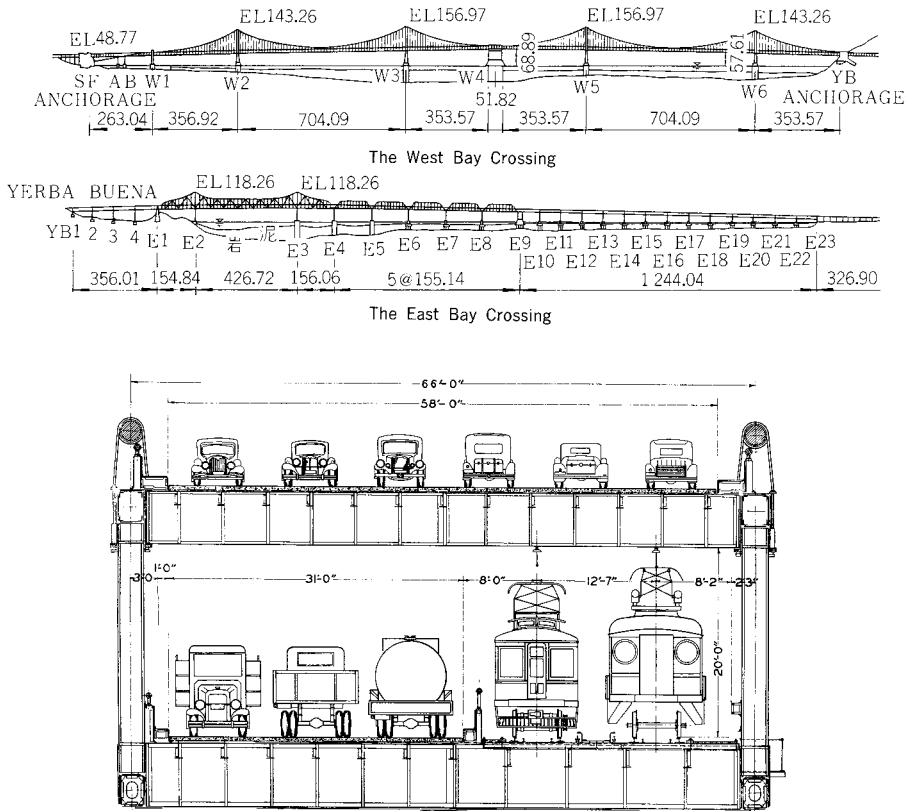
San Francisco-Oakland Bay Bridge, original plan and cross section.
